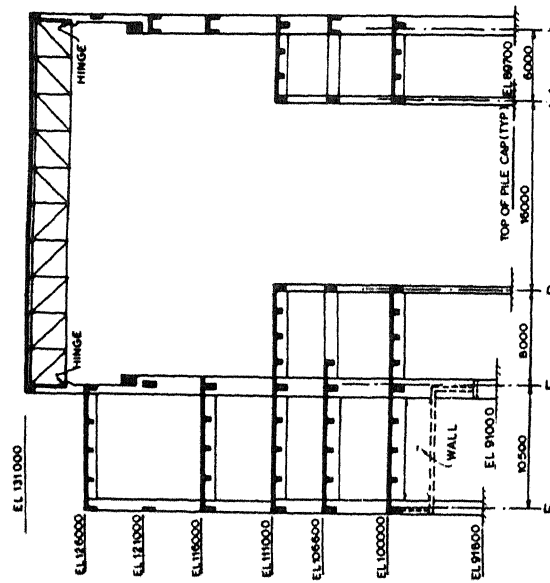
CROSS-SECTION OF THE BUILDING ALONG GRID-6
